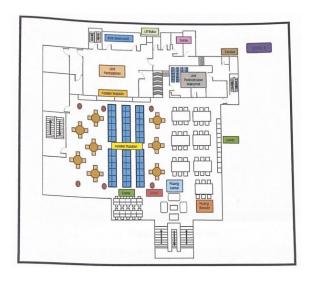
(b) Tengku Anis Library Floor Plan Level 2
